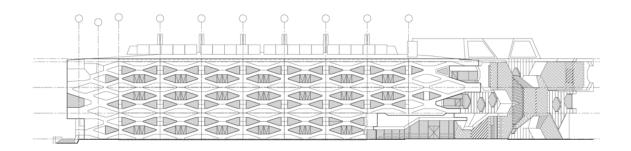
North Elevation (ArchDaily 2012)
